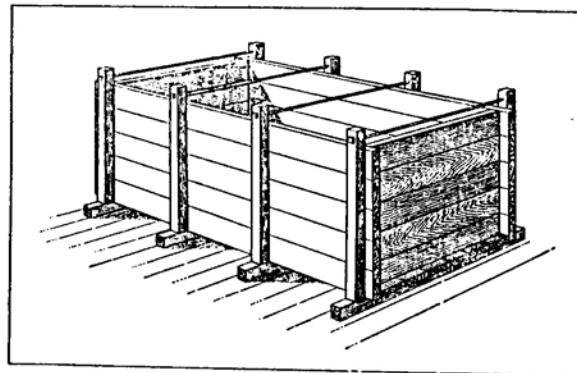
A GOOD METHOD OF WOODEN STORAGE TANK CONSTRUCTION
